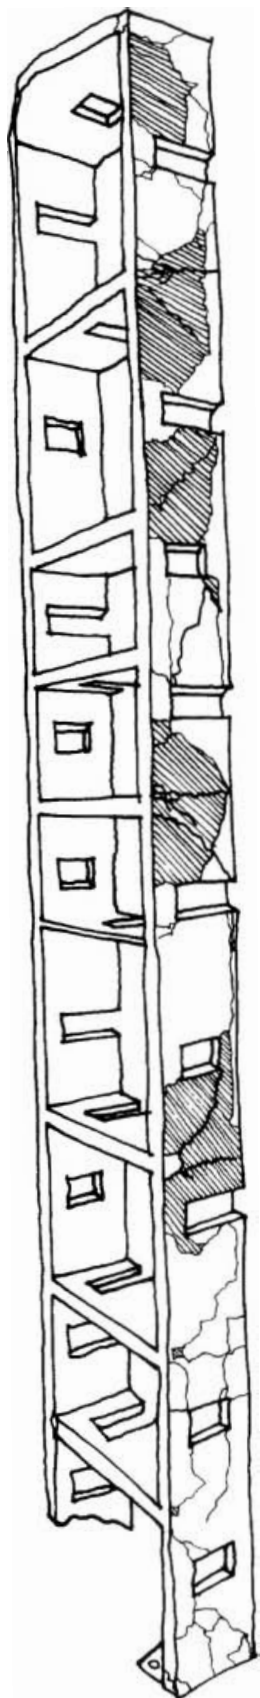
De la Osa Adobe. North elevation showing earthquake crack pattern and plaster damage.
